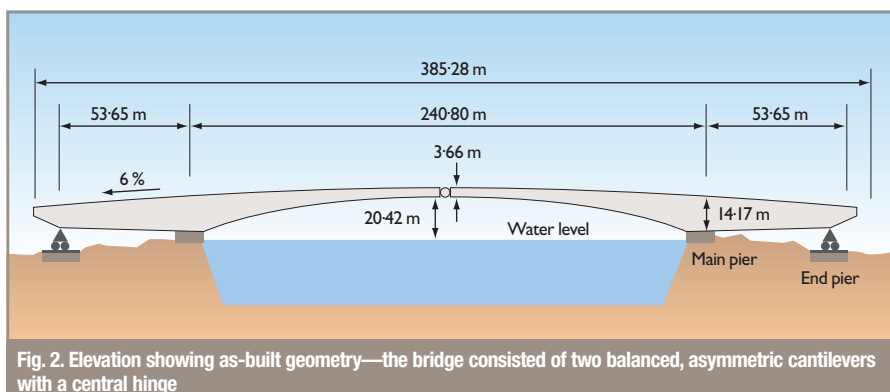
Elevation showing as-built geometry—the bridge consisted of two balanced, asymmetric cantilevers with a central hinge
